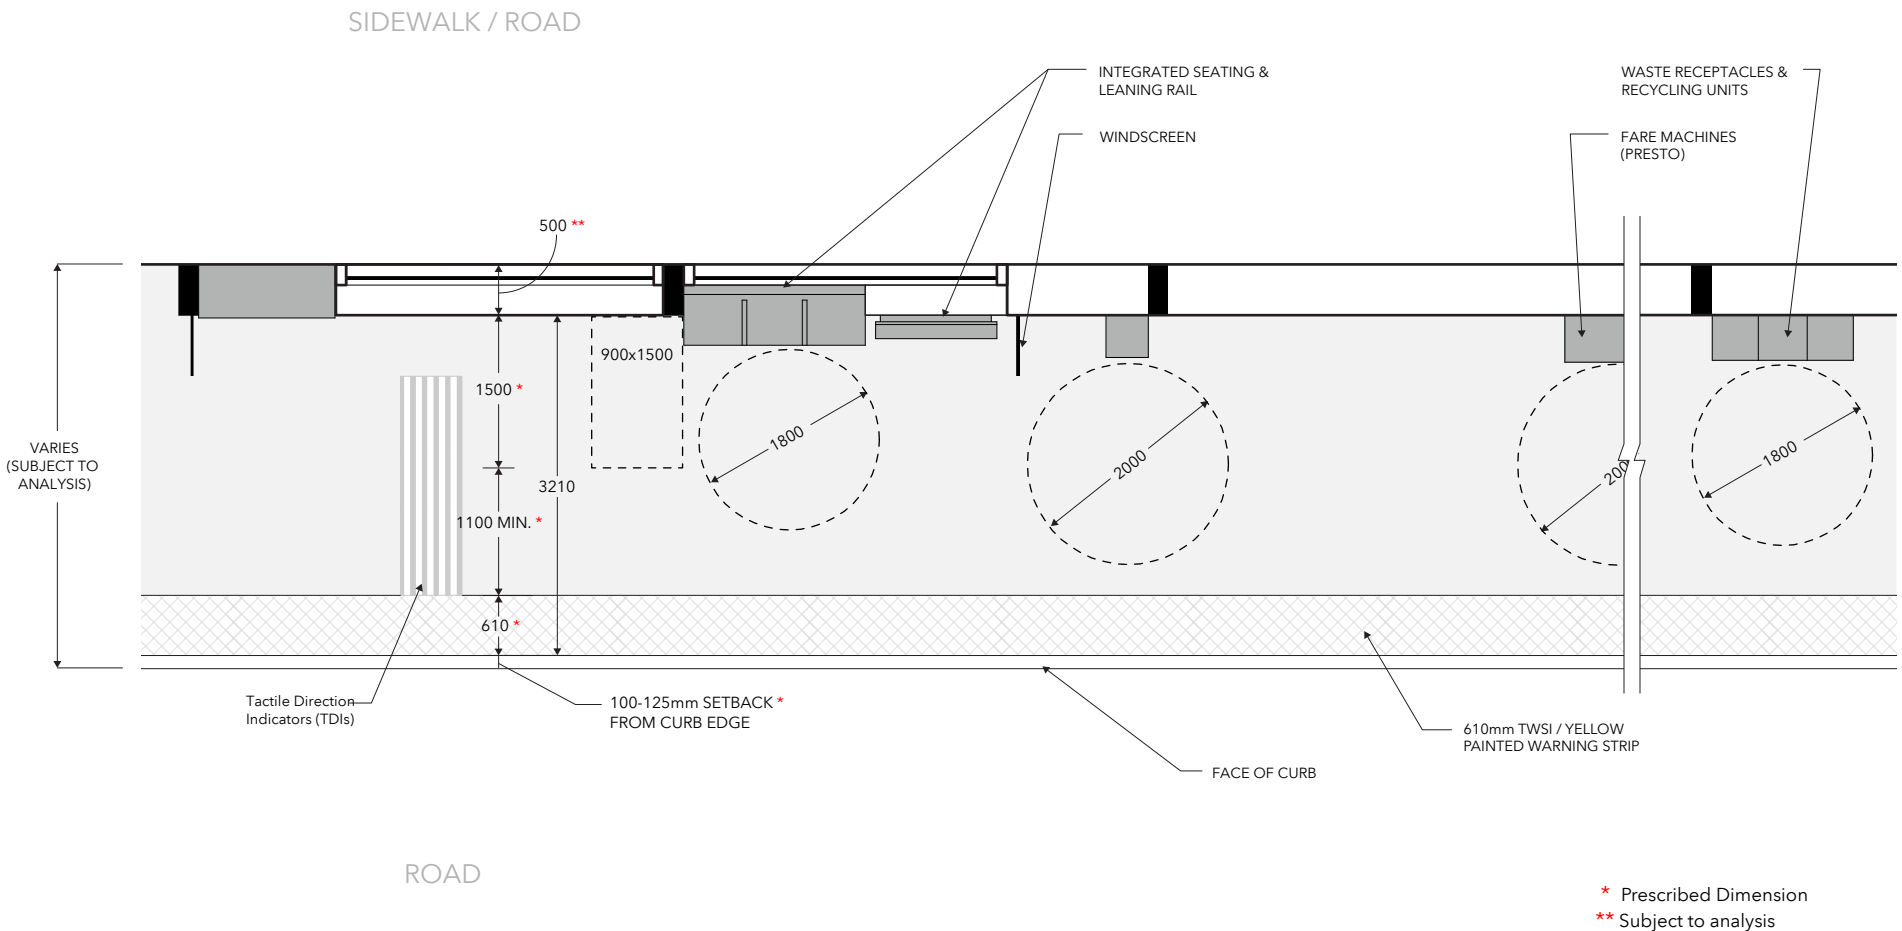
Typical dimensions of open shelters (dimensions in millimetres)
